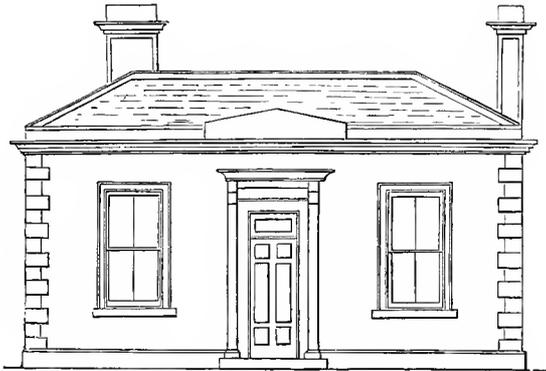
Front elevation of a single-storeyed detached cottage—scale in fig. 736.
